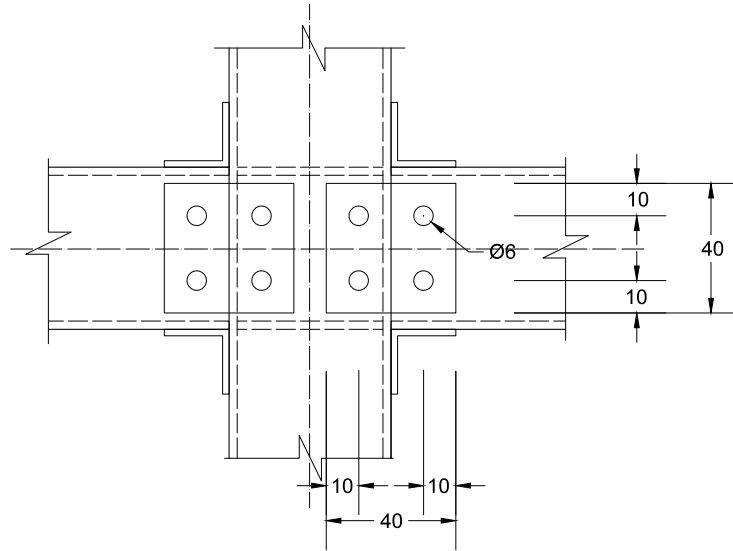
Design of Specimen A3: fully bolted beam-to-column connection
